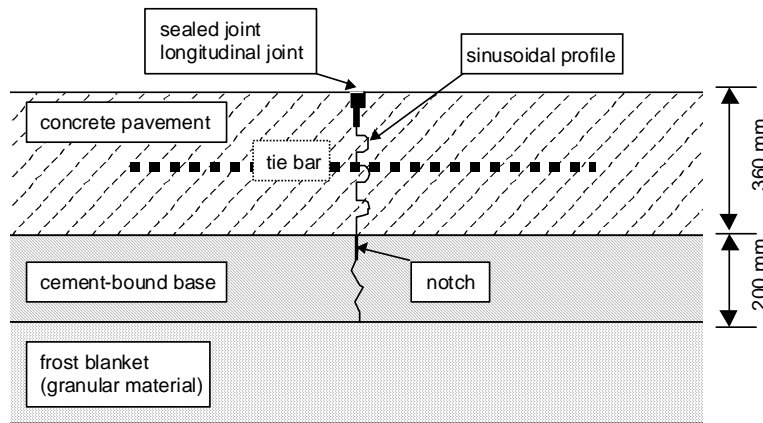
Sealed, longitudinal joint in the runway concrete pavement, the cement-bound base is notched underneath the joint;
